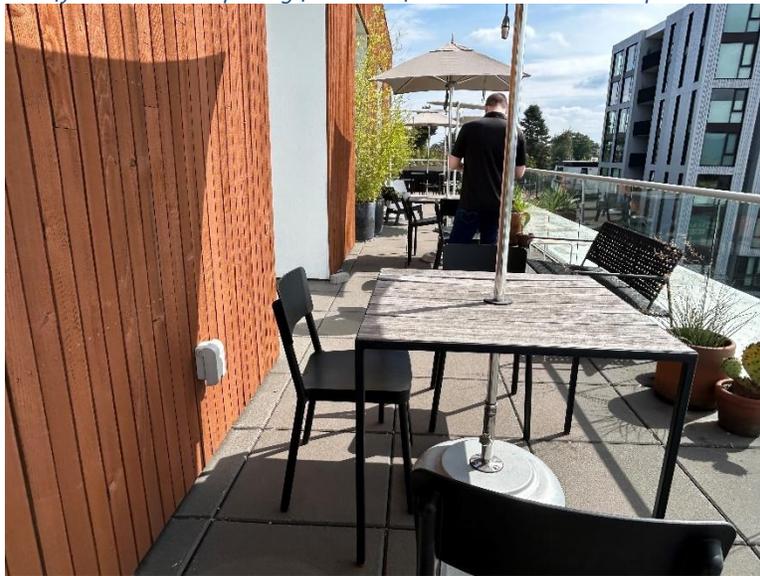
Karuna II West south terrace view east. Concrete paver finish over roof with drains below. Glass guard rail height at perimeter conforms with code minimum.
